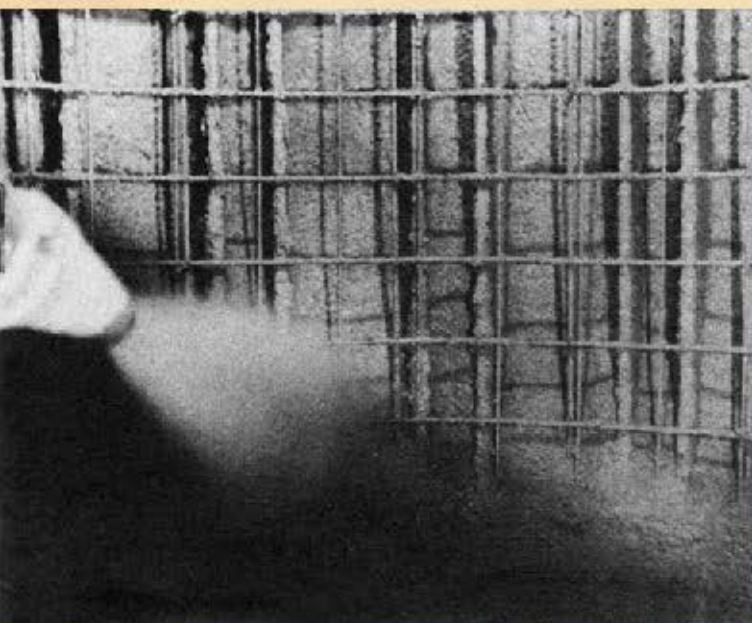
Shooting concrete lining in steel stack. Section of 200-ft stack, diameter about 8 ft
